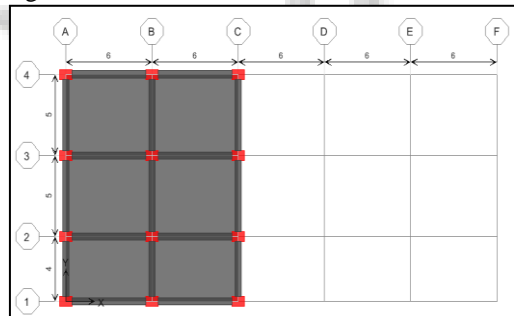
Plan view from 8<sup>th</sup> Floor to Top Floor
